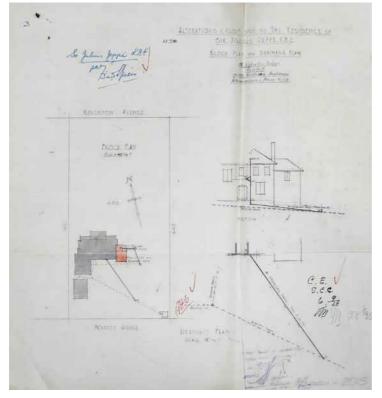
Alteration and addition plan for the Residence of Sir Julius Jeppe by H.W. Spicer along the eastern elevation of the building structure (Source: City Council of Johannesburg, Plans Archive)
